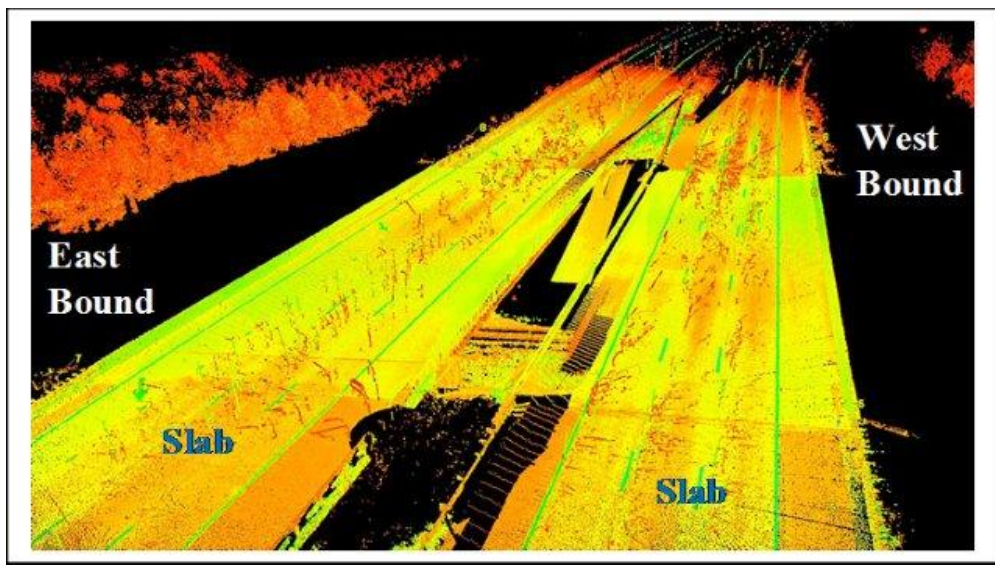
LIDAR image of US-64 bridge over railroad.
